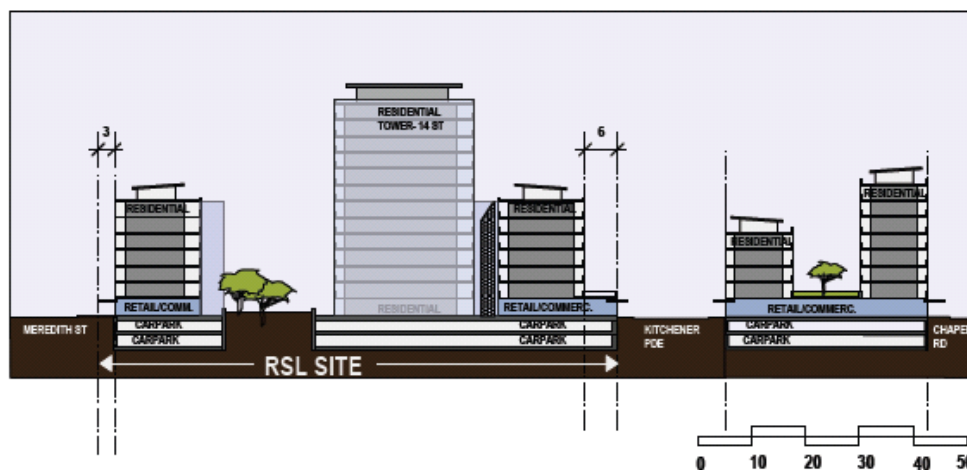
Proposed building envelope for mixed use development on this key strategic site as viewed from Meredith Street (not to scale)
